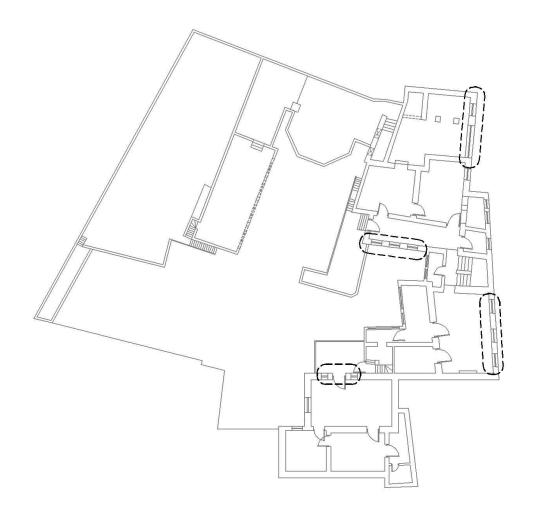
First Floor Plan Showing Two or More Openings in the Same Wall
